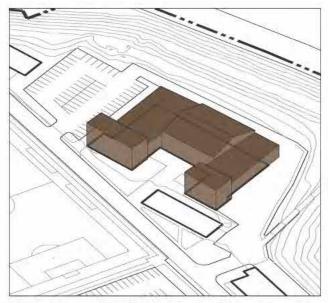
Axonometric and Site Plan of renovated Huntley gymnasium
